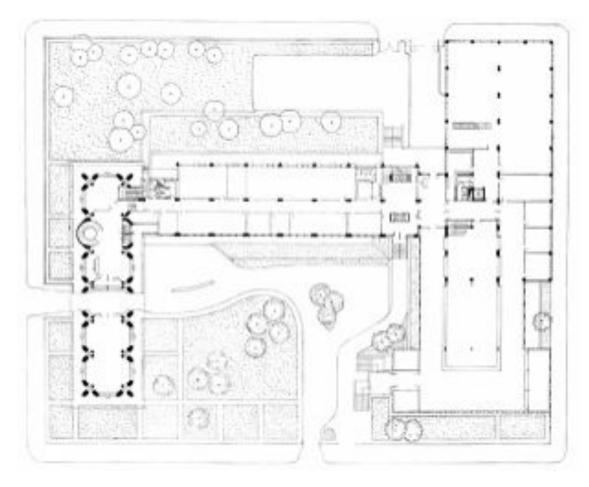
Plan of the ground floor (Archivio Progetti IUAV)
